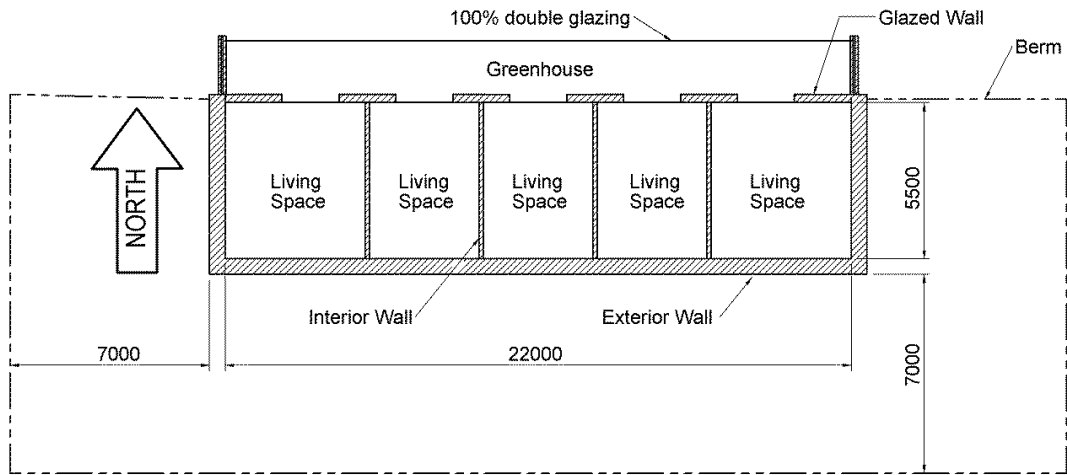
Functional Unit Floor Plan for Passive Solar Design (with Greenhouse and Berm).
